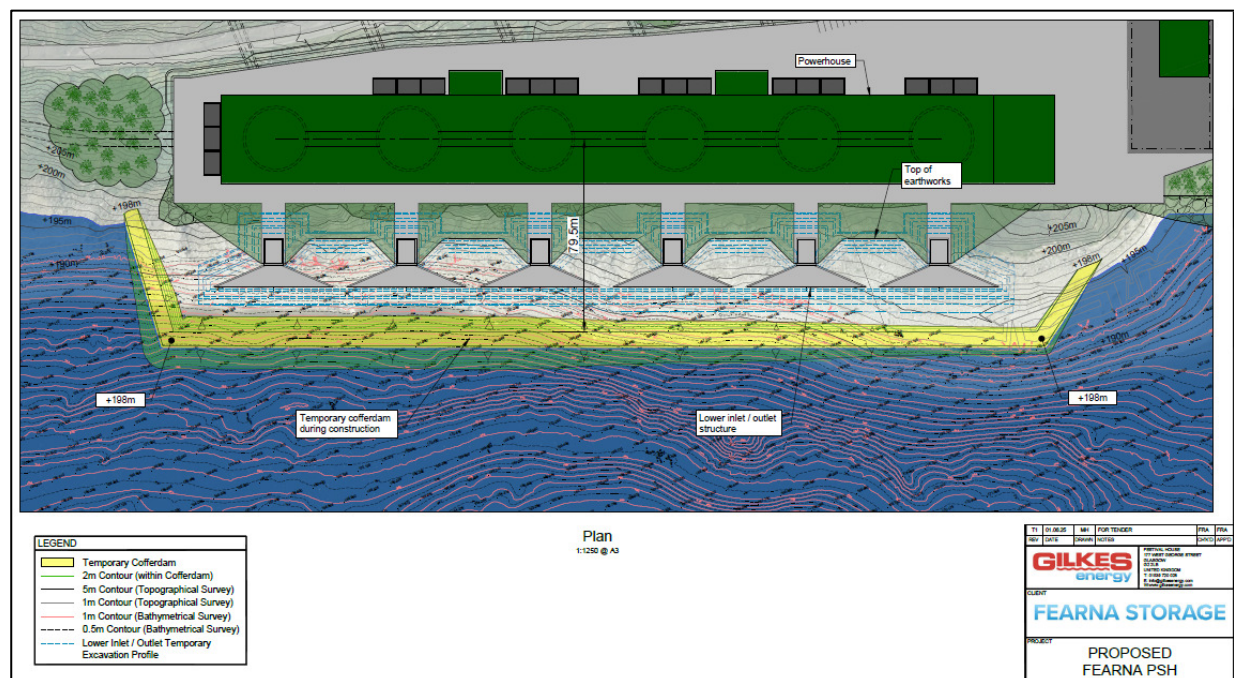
Powerhouse and Lower Control Works Plan showing Cofferdam
